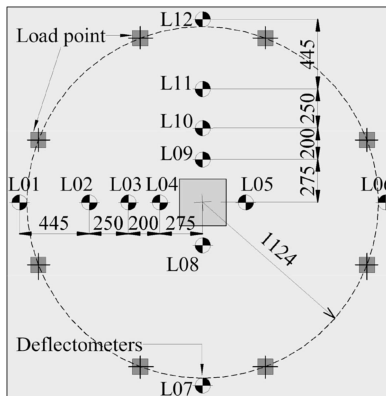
Loading and deflectometer arrangements as used in the test system (all dimensions mm)
